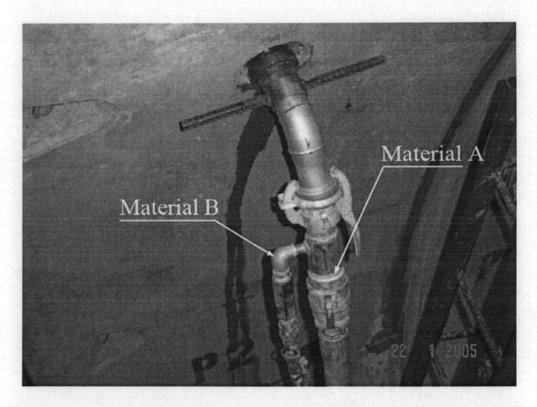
Grouting pipe attaching to grout hole (BMA flood diversion project,
